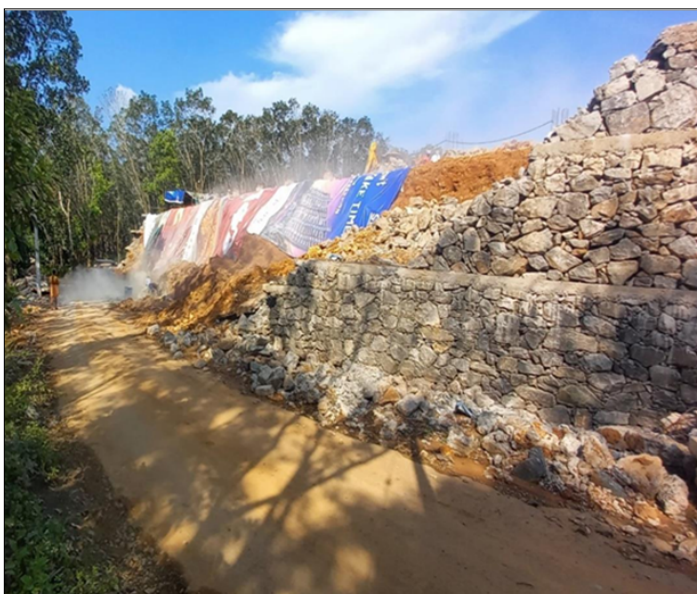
& 2 : View of the Collapsed Existing Stone Masonry Retaining Wall
